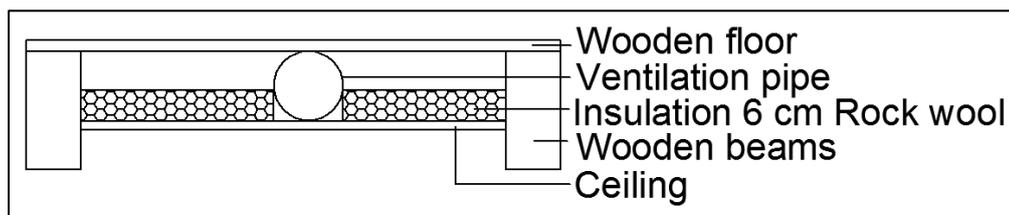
Detail of the pipes between the ceiling and the wooden floor from the next level
